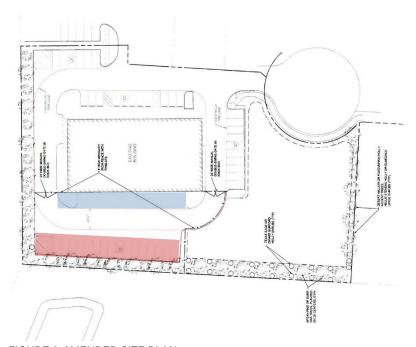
AMENDED SITE PLAN RED: PROPOSED OUTSIDE STORAGE AREA
